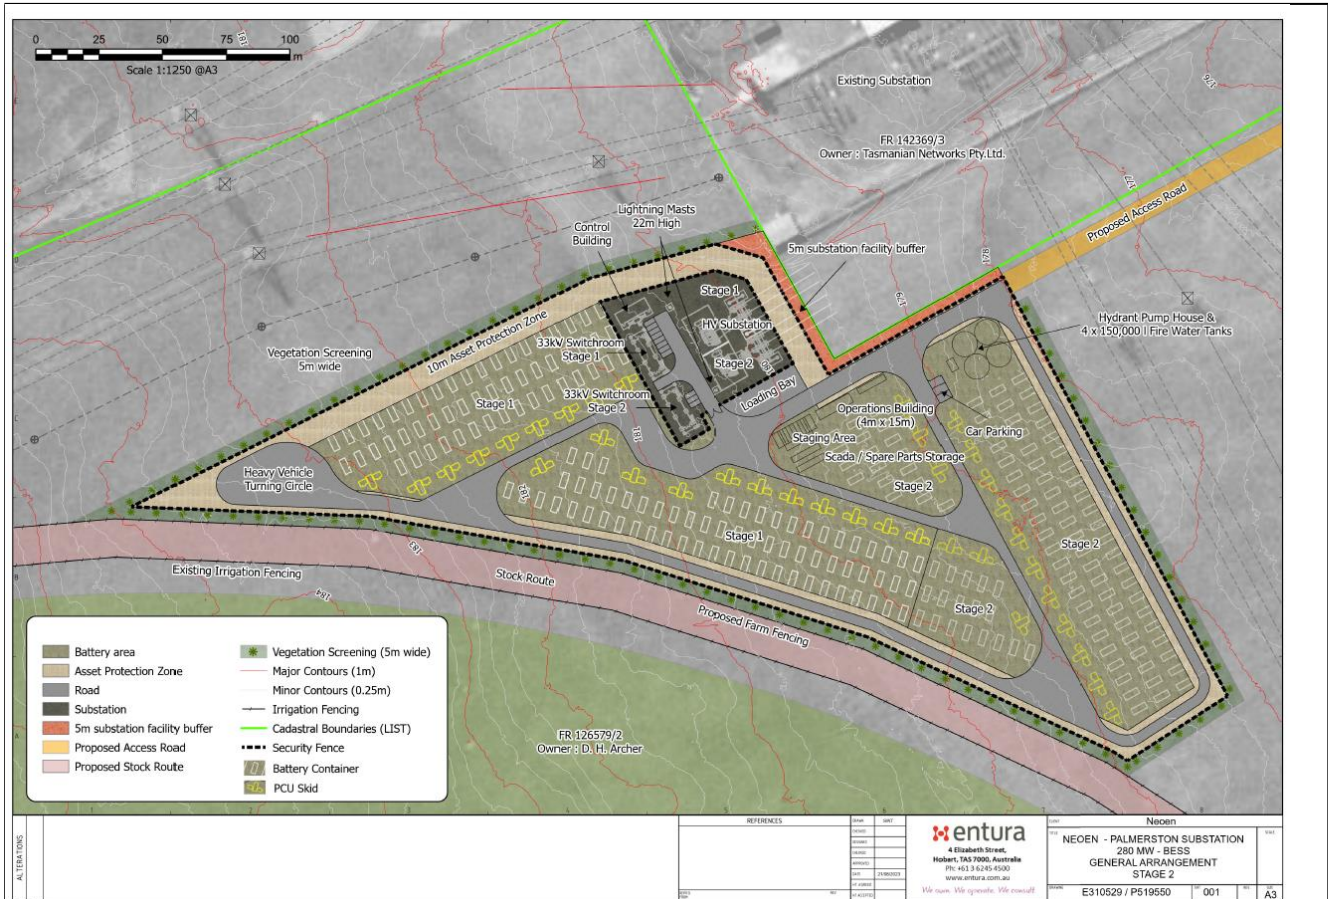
Battery storage layout showing that buildings will be a minimum of 5m from the substation facility.
